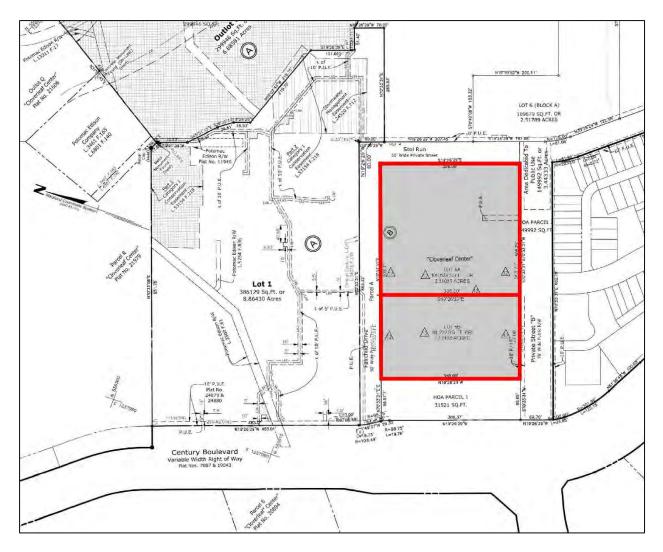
Lotting Plan (Subject Property Outlined in Red)
